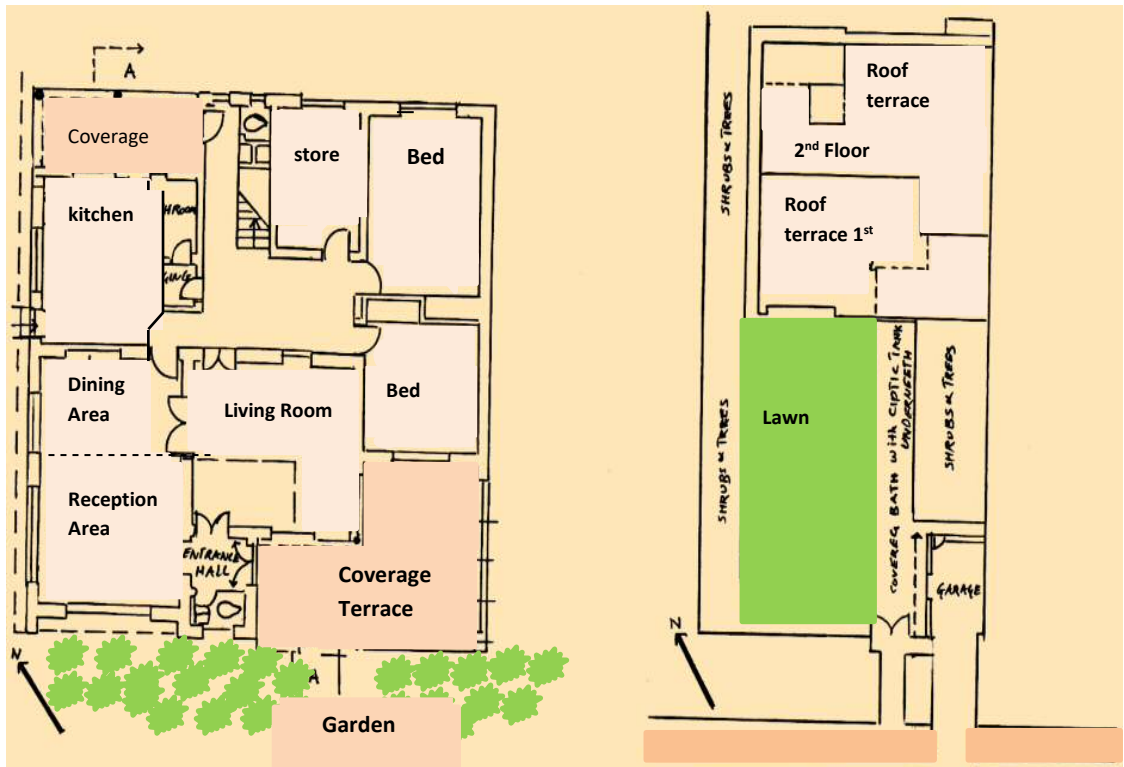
Site plan and ground floor level plan of the modern house No. 2. Scale: 1:100
